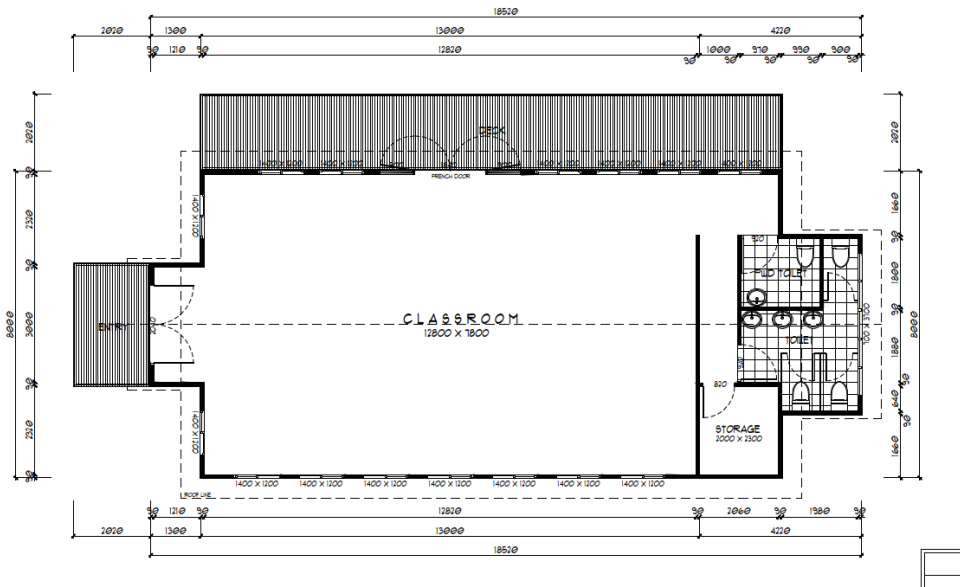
Proposed floor plan of the two classrooms (EcoView Design).
